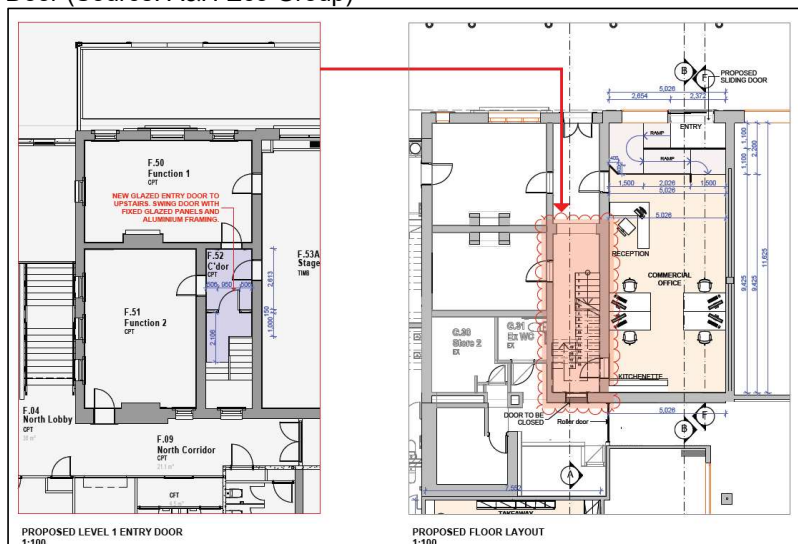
Proposed Floor Layout – Proposed Commercial Office layout and Level 1 Entry Door (Source: A&H Eco Group)
